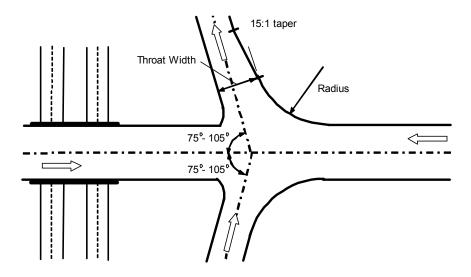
Discontinuous Ramp Alignment at Ramp/Crossroad Junction.
